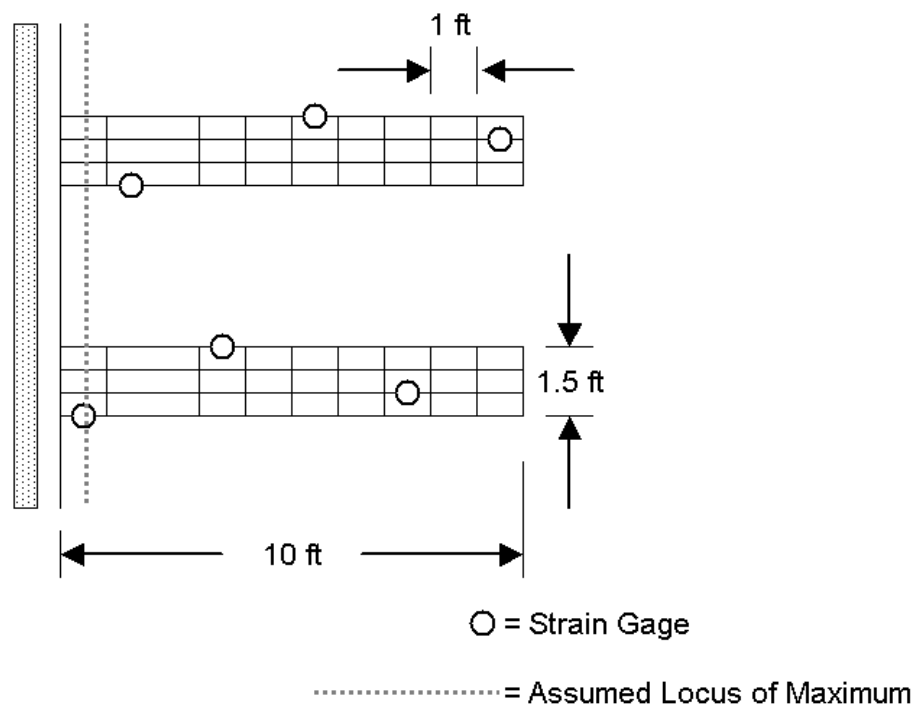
Plan view of instrumented intermediate bar mat 3W11-12 at level 1.5.
